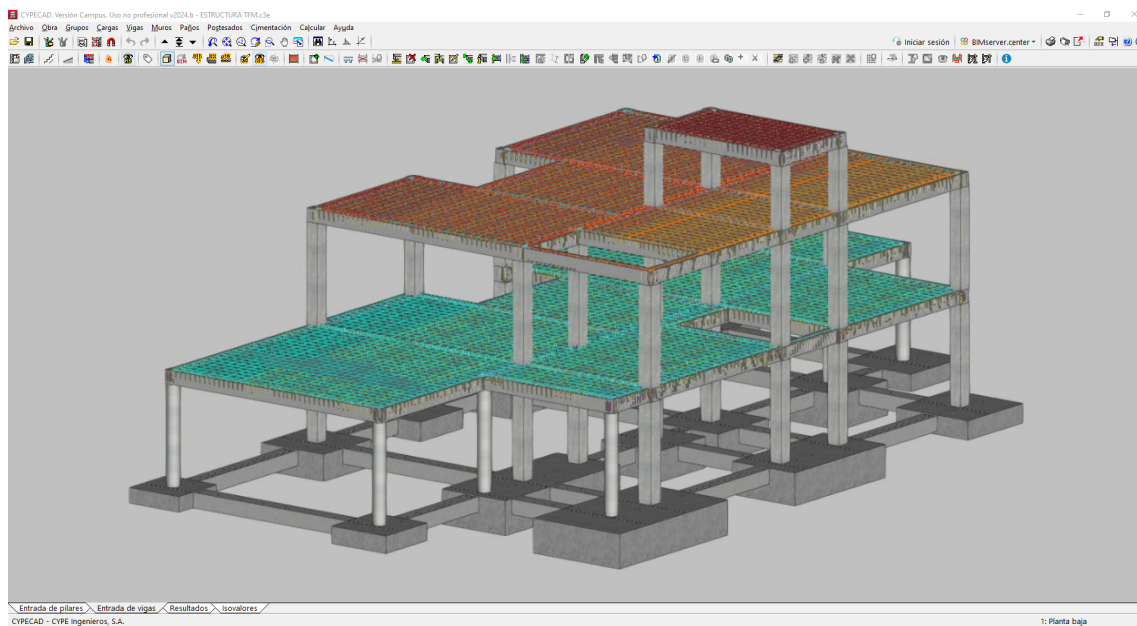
Reinforced concrete structure of the single-family house in CypeCAD
